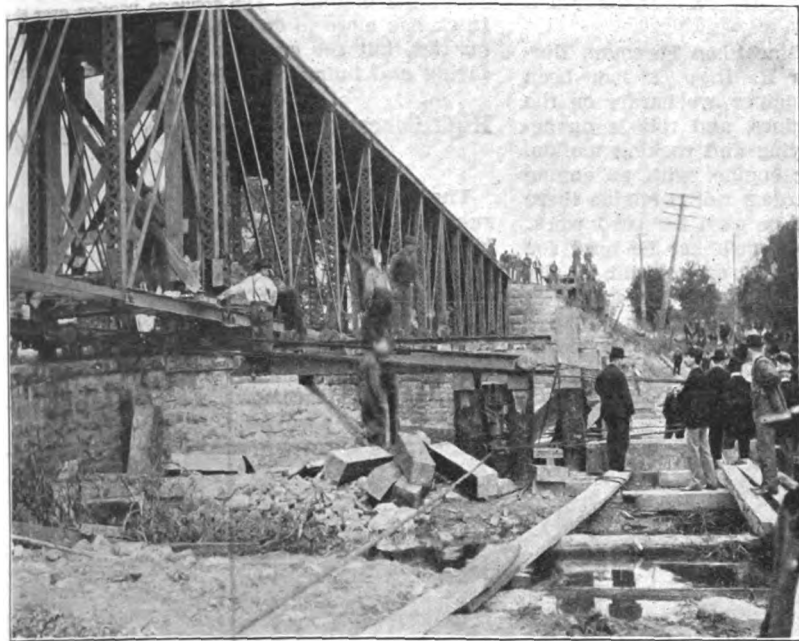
MOVING A FOUR-SPAN STEEL TRUSS DECK BRIDGE TO MAKE ROOM FOR STONE ARCH CONSTRUCTION, C. M. & ST. P. RY.
